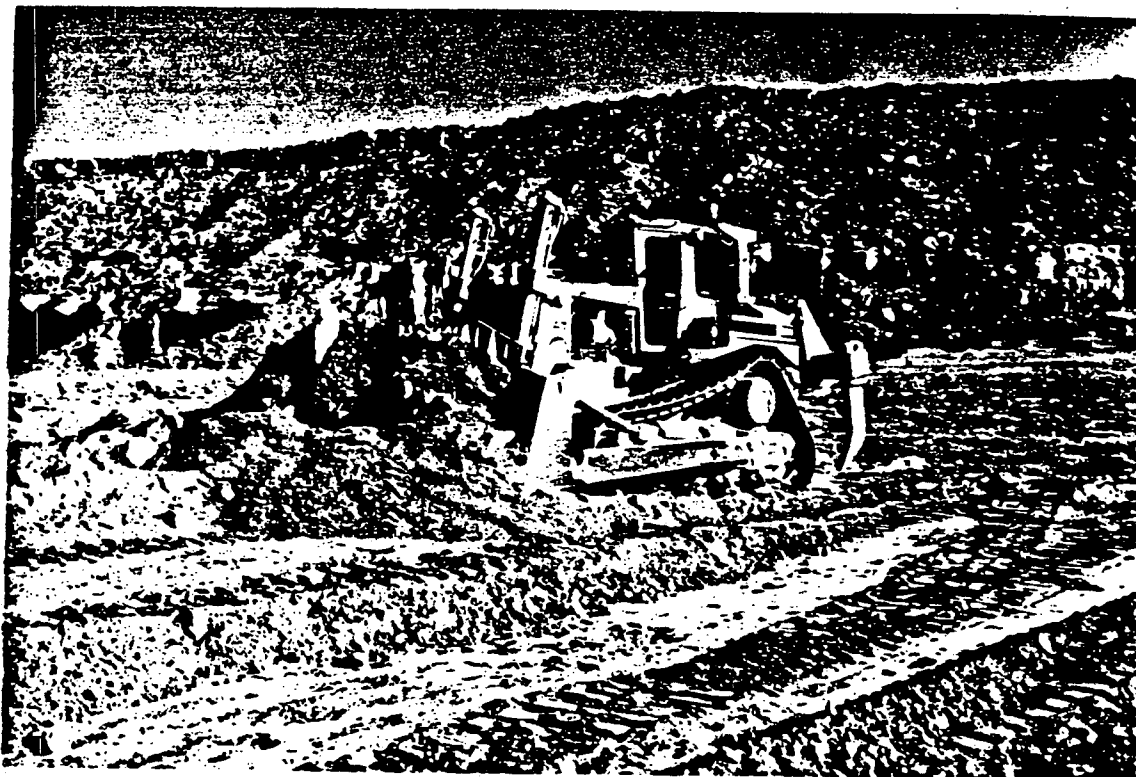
N pushes "clean" fill over buried protore and mine tailings on Section 24 (Brown-Nanabah). Note, Haystack Mountain in background. (photo by Robert Bornstein)
